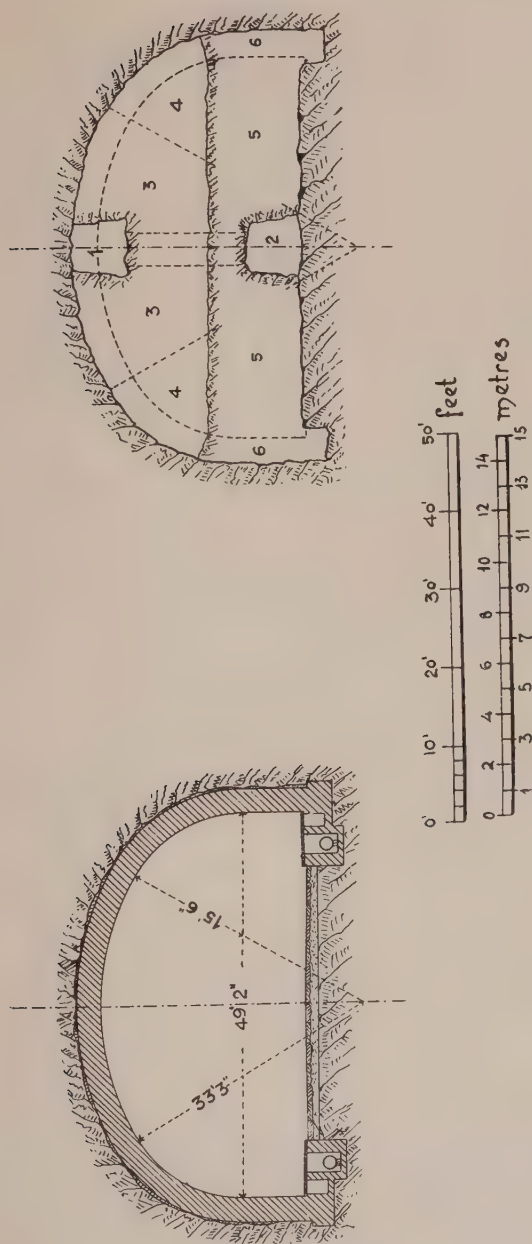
(left). Faro Tunnel Near Genoa, for Ordinary Traffic. Section Through Good Limestone Rock, with Light Revetment.
